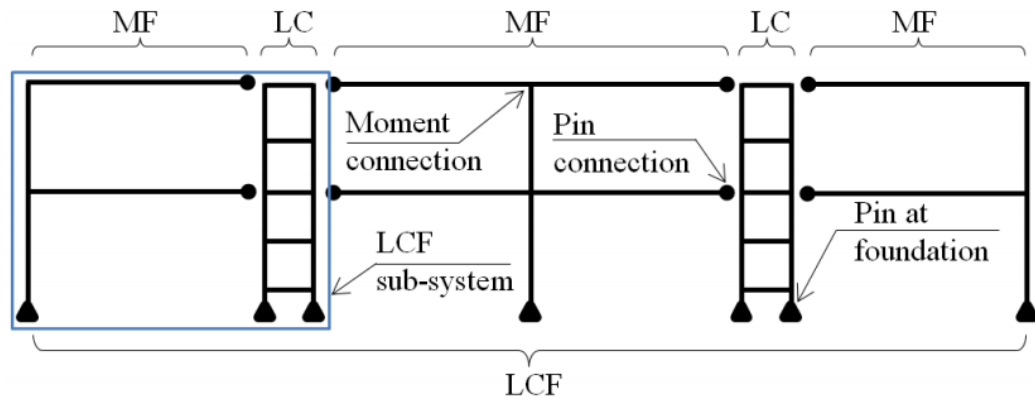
LCF layout for a 2-story building (Lopes et al., 2014)
